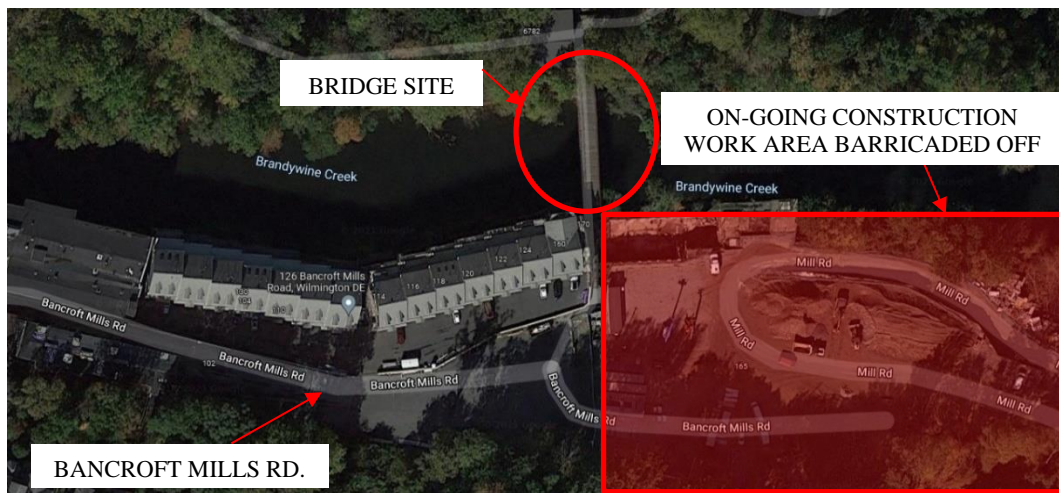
Bancroft Mills Rd. at South end of the pedestrian bridge
